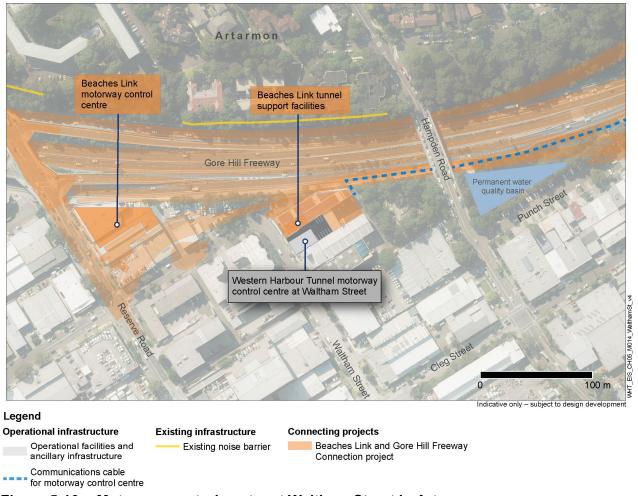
Motorway control centre at Waltham Street in Artarmon
